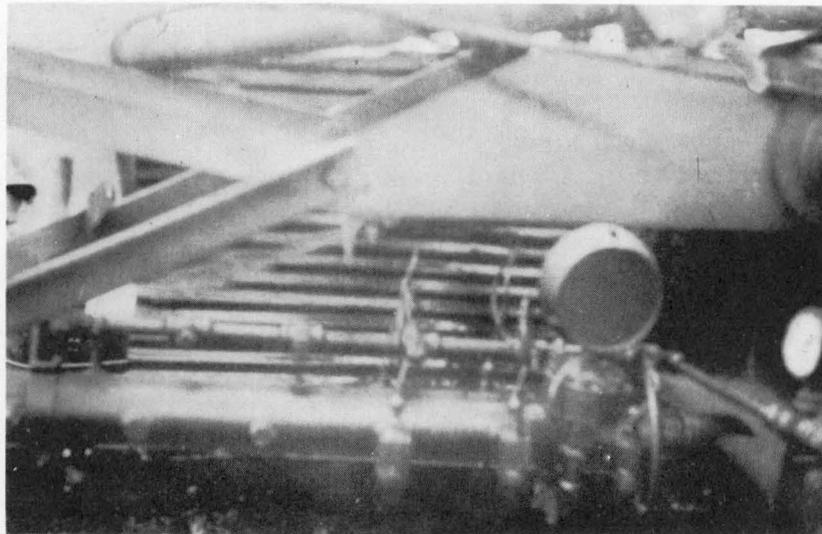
Foamed asphalt spray bar in a continuous mix plant.
